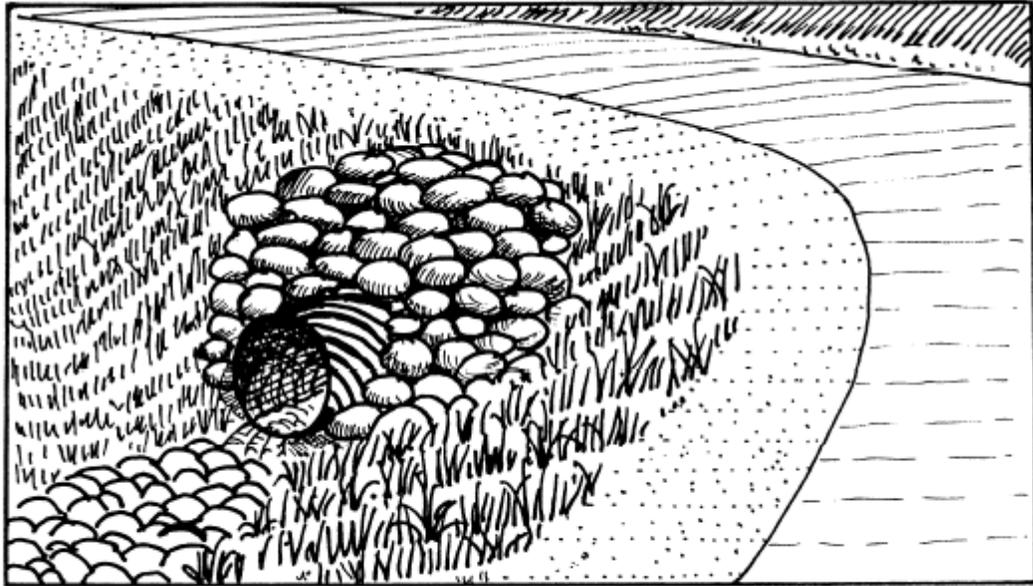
Rock headers on culvert outlet: headers (on 2:1 slope) at both ends prevent erosion.
